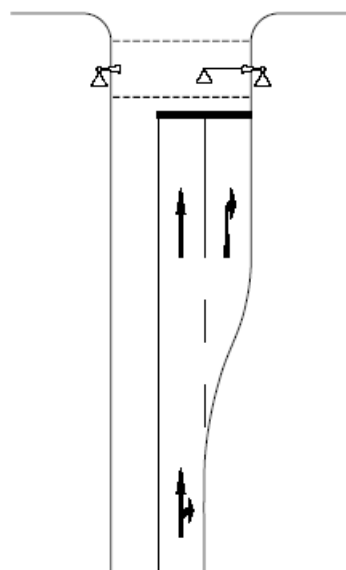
Example of the arrangement of additional signal heads at an expanded intersection
